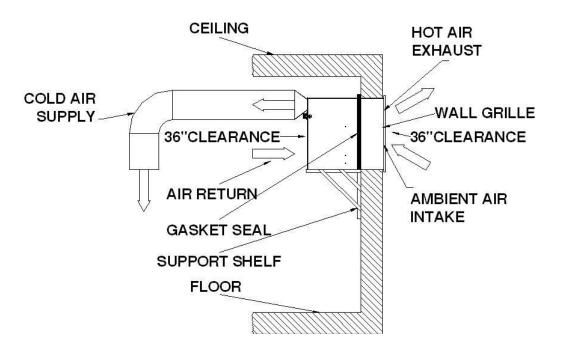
Flush to the outside of wall with cold-air supply duct & wall grille
